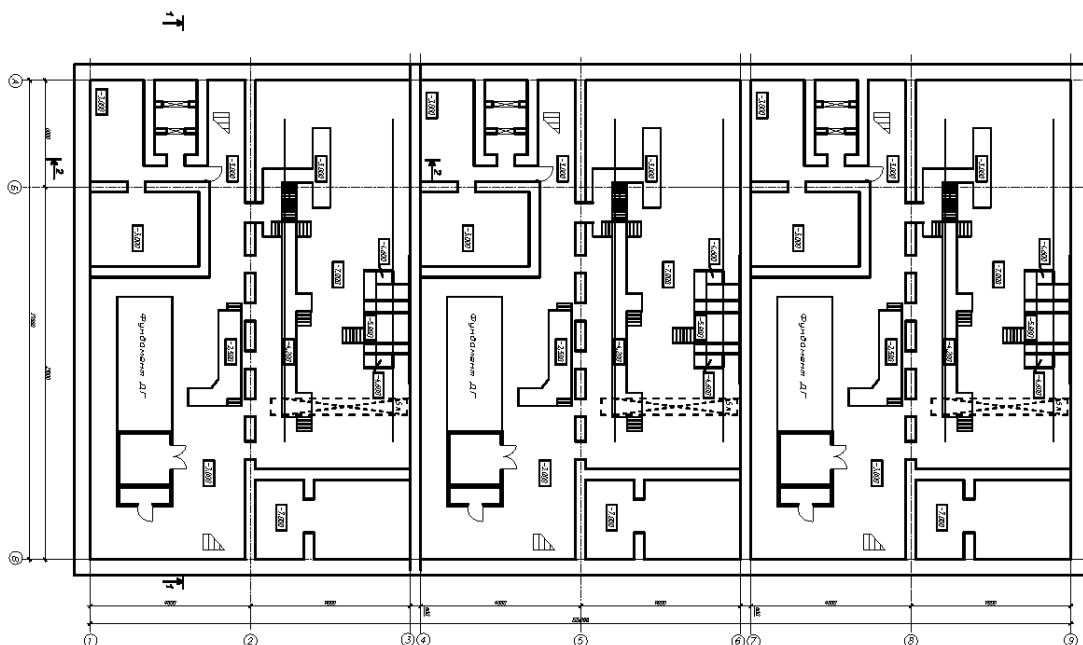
Diesel Generator Building (1DGB-2,3) plan, elevation -3,000; -7,000
